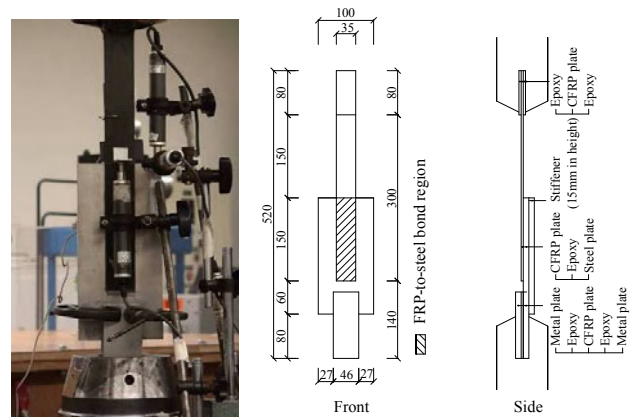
Stiffened single-shear FRP-to-metal joint test set-up
